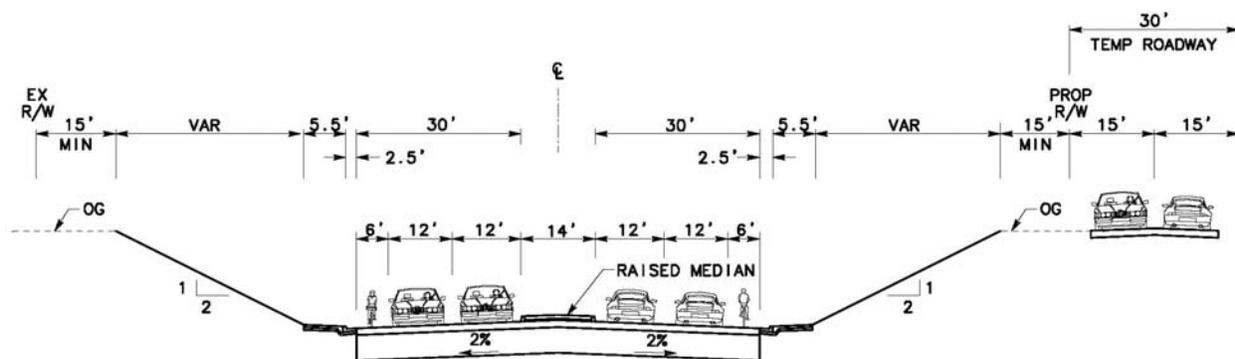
Alternative 4 – Underpass with Side Slopes (Looking East)
